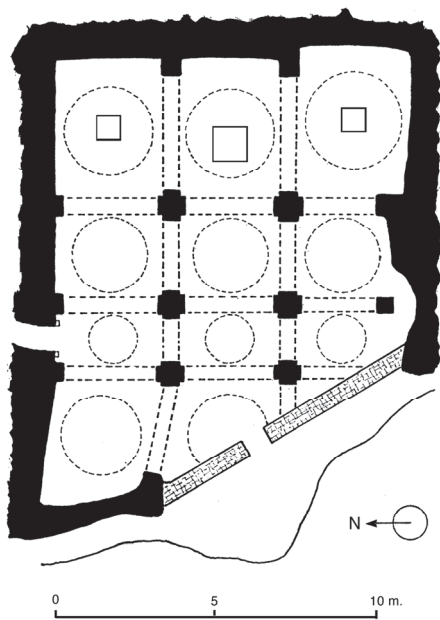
Church of Abba Yohanni, Tämben, Təgray, floor plan; after R. Plant
